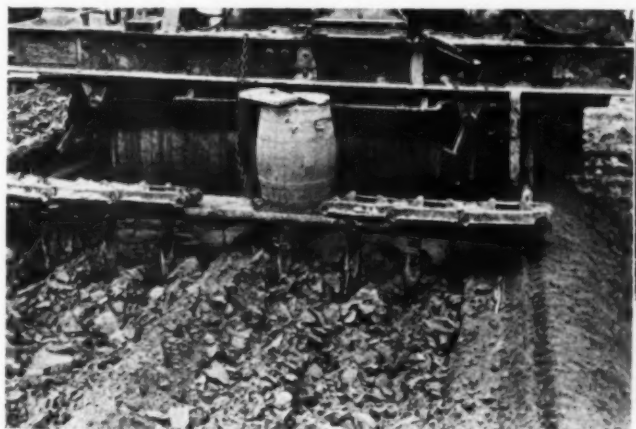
Closeup of Scarifier Teeth Attached to Machines Used for Spreading. They Break Up Partially Compacted Material. Note Size of Clods Left
